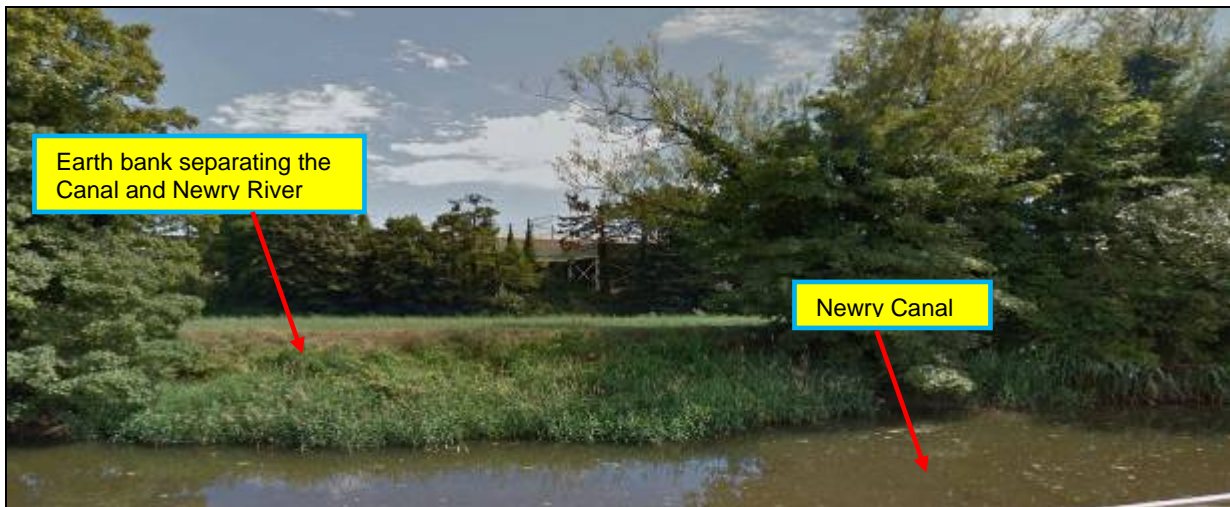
Earth flood bank that separates the Newry Canal and the Newry River that was raised in 2001
